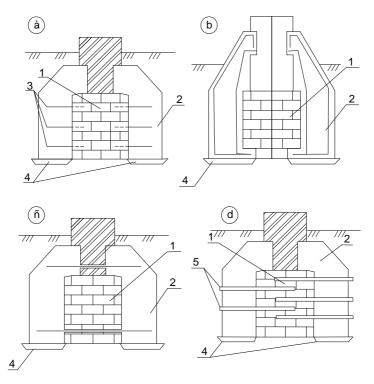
Broadening the base of strip foundation by building-up the protrusions:
